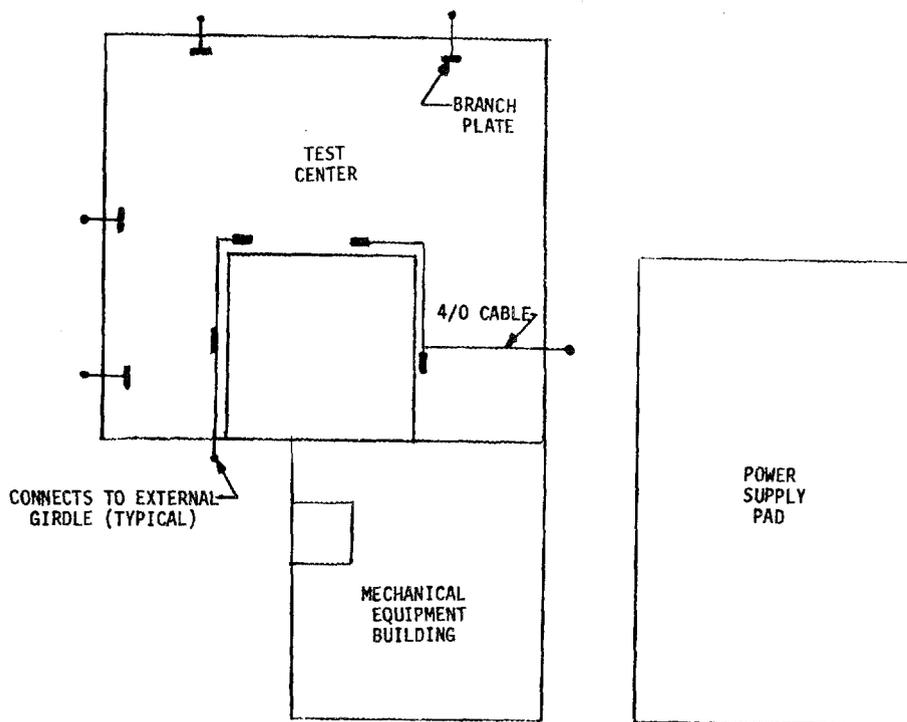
GROUND SYSTEM BRANCH PLATE LAYOUT - TEST CENTER - LEVEL TWO
